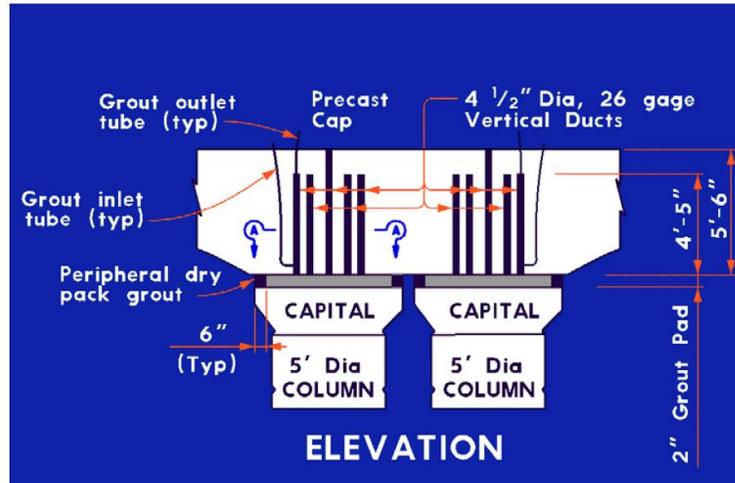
6 Grouted Reinforcement PT Duct Layout [8].
